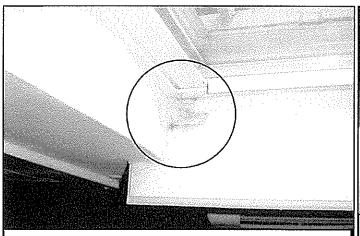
Looking down from roof. Heavy application of caulking on cap for bump out.
